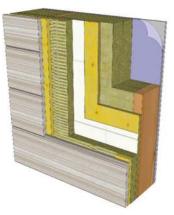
Split insulated wall assembly with mineral wool insulation installed over a 2x6 insulated wood-frame wall
